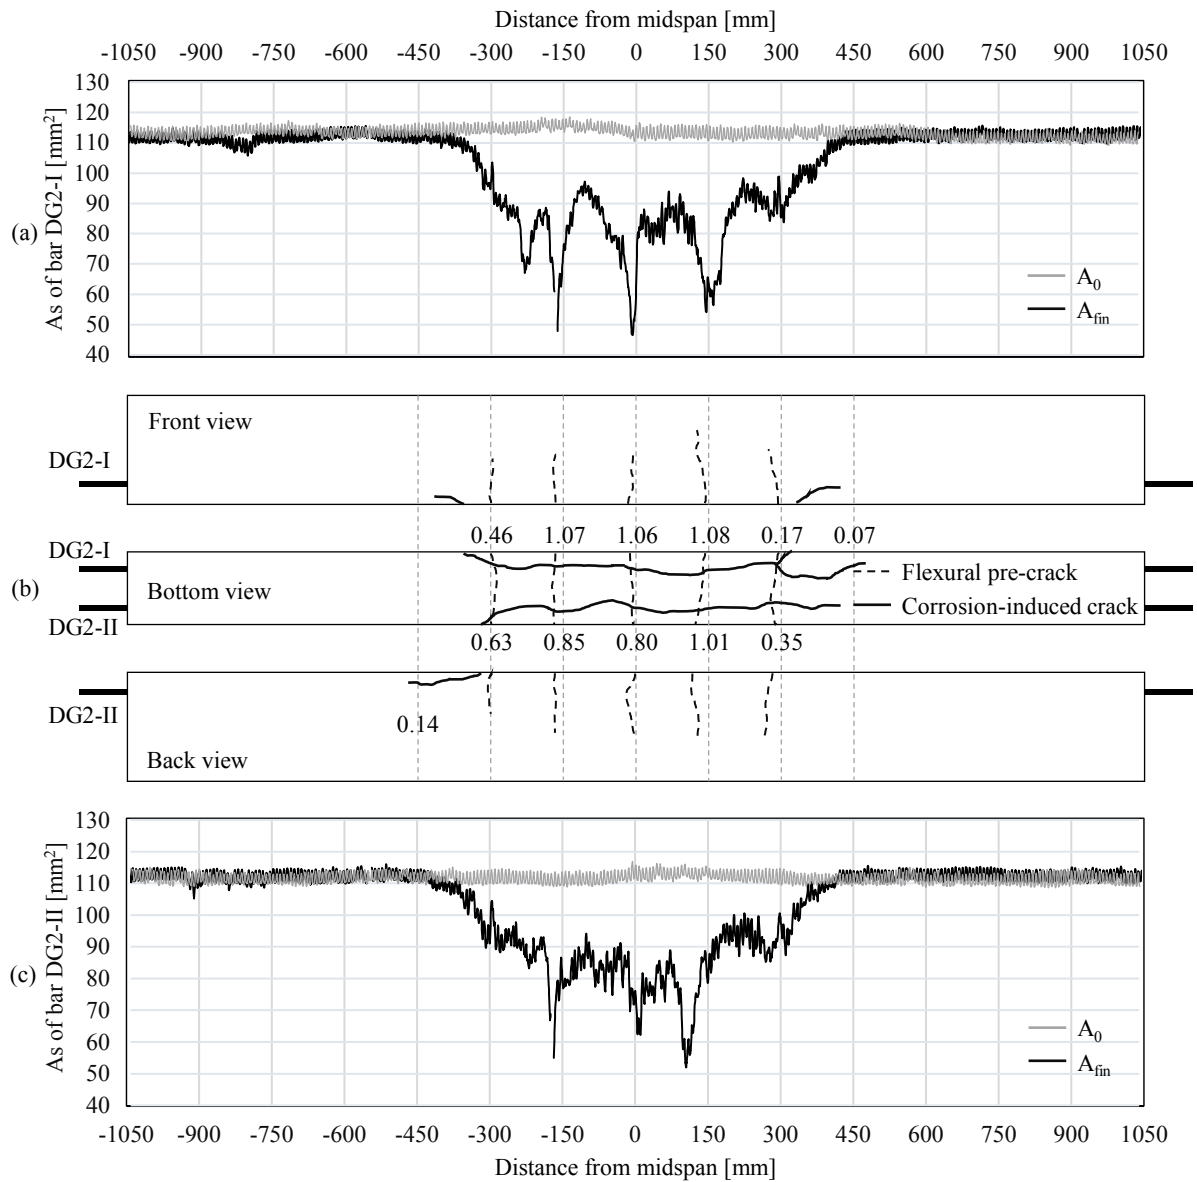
(a, c) Cross-sectional areas of the tensile reinforcement bars I and II in specimen DG2; (b) flexural pre-cracks and corrosion induced cracks, of which the widths (unit in mm) were measured every 150 mm;  $A_s$ —cross-sectional area;  $A_0$ —cross-sectional area of steel bars measured in the initial state before casting beams;  $A_{\text{fin}}$ —cross-sectional area of steel bars measured in the final state after taken out from the tested specimens.
